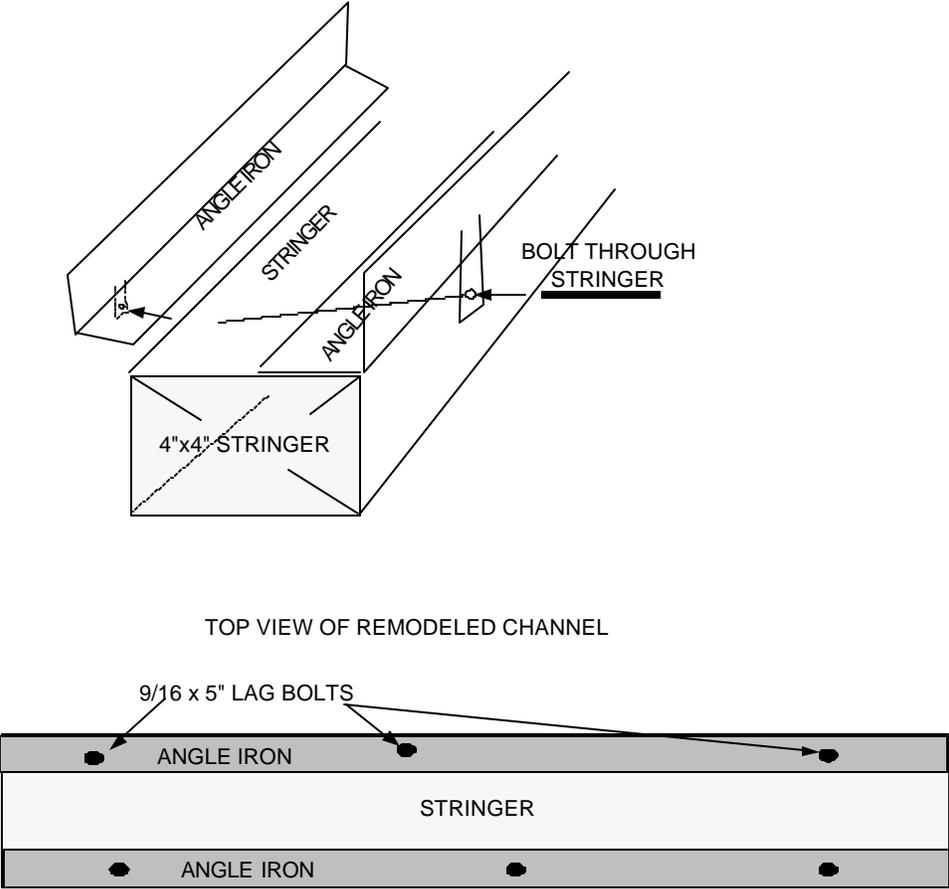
Angle iron attachment to the front stringer of the diversion weir, Frazer Lake, 2003.
